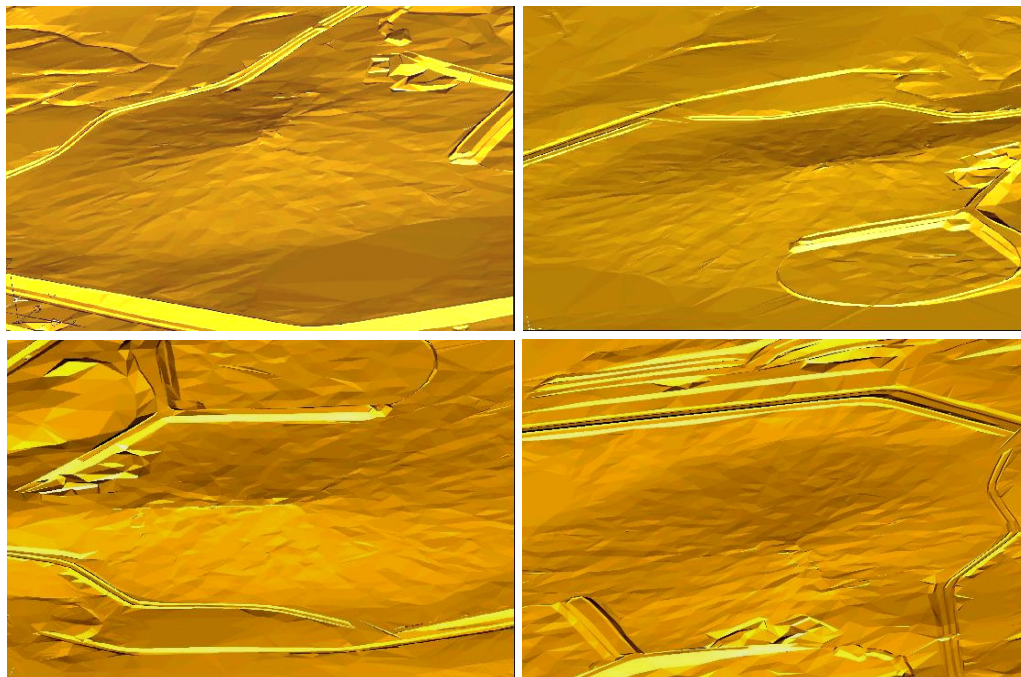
Isometric views of the thickened trial on the new tailings facility
